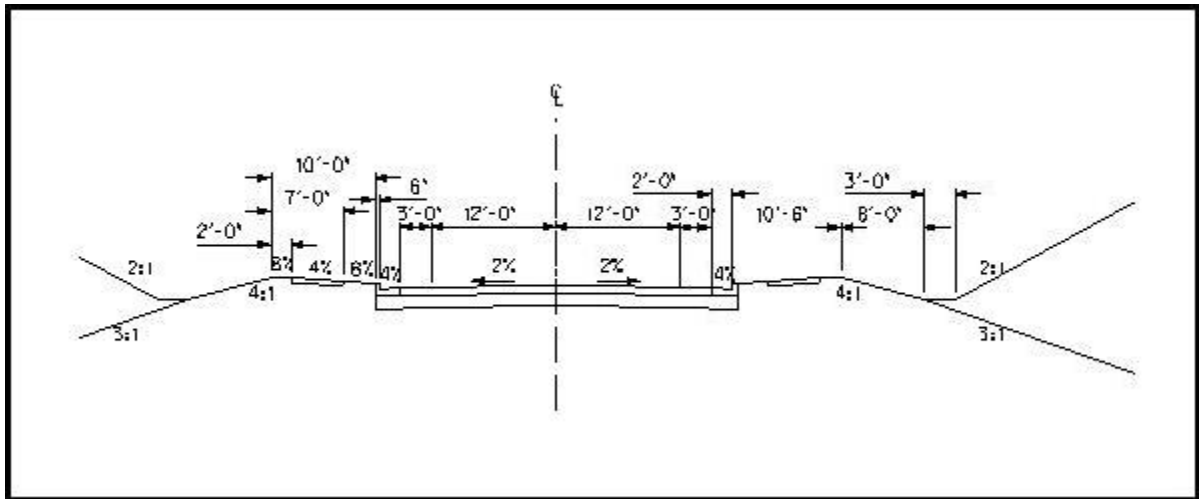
Typical Section: Two-lane Curb and Gutter
